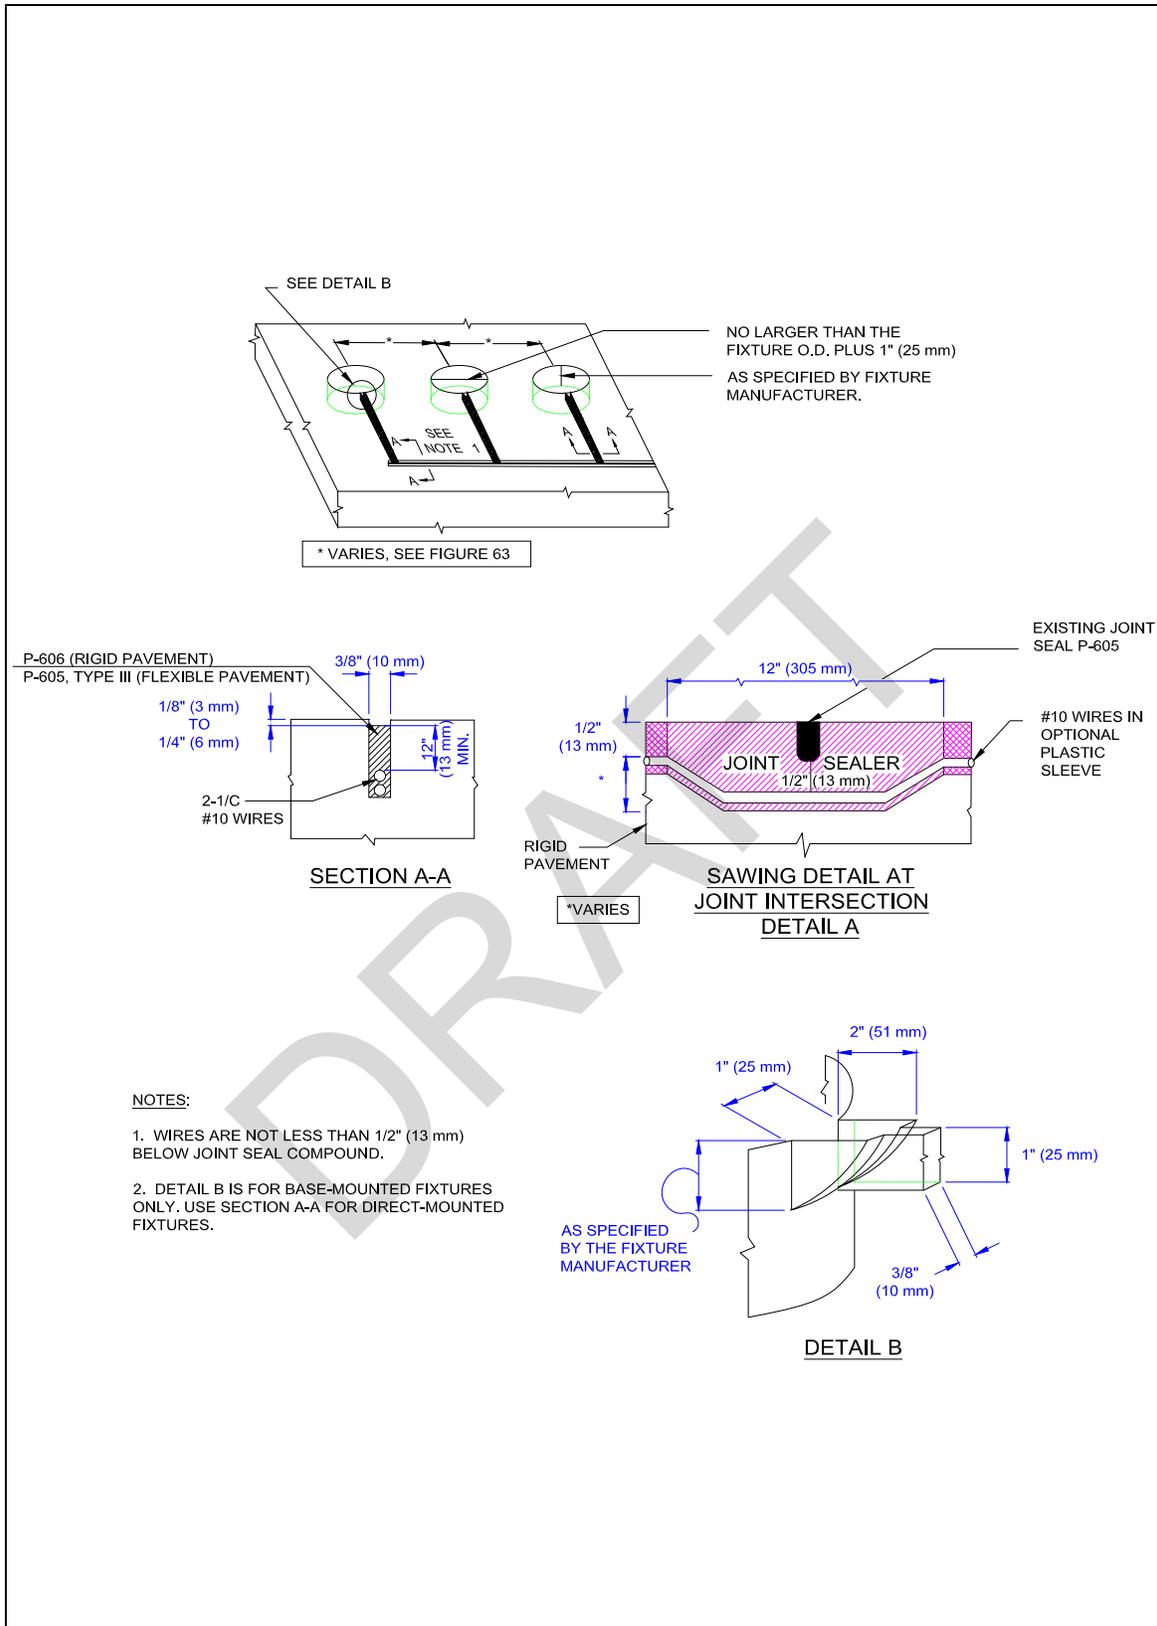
Sawing & Drilling Details for In-pavement Land & Hold Short Lights.
